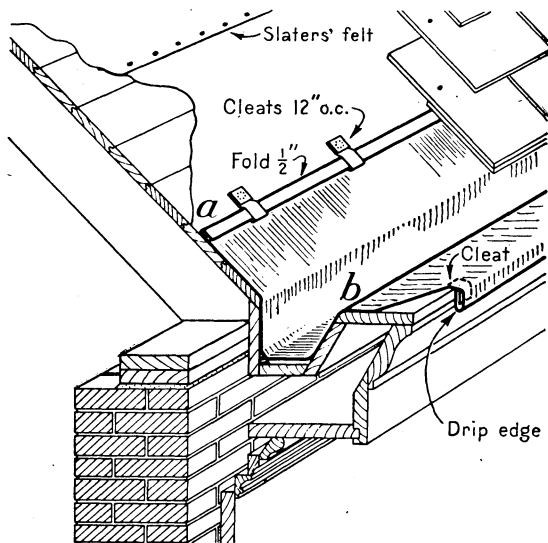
Built-in gutter. Flashing should be at least 2 inches higher at *a* than at *b*.
